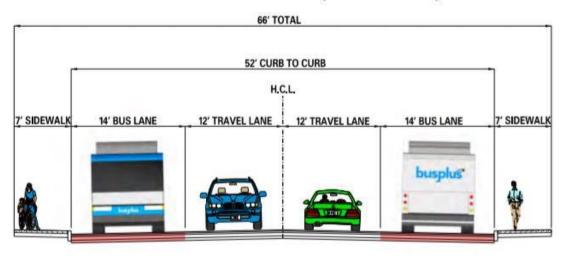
River Corridor Alternative 2 – Broadway (NYS 32) between Clinton Avenue and 1st Street
